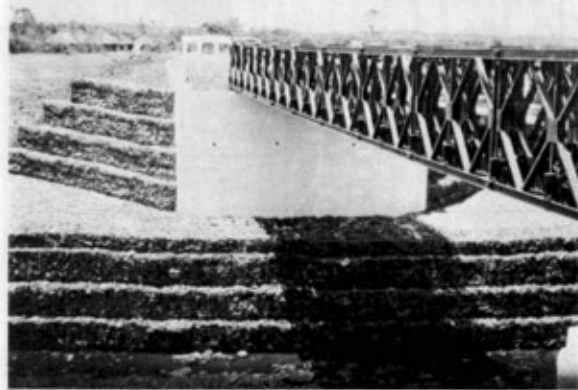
The completed bridge showing gabion layout and abutment finish cast bank
